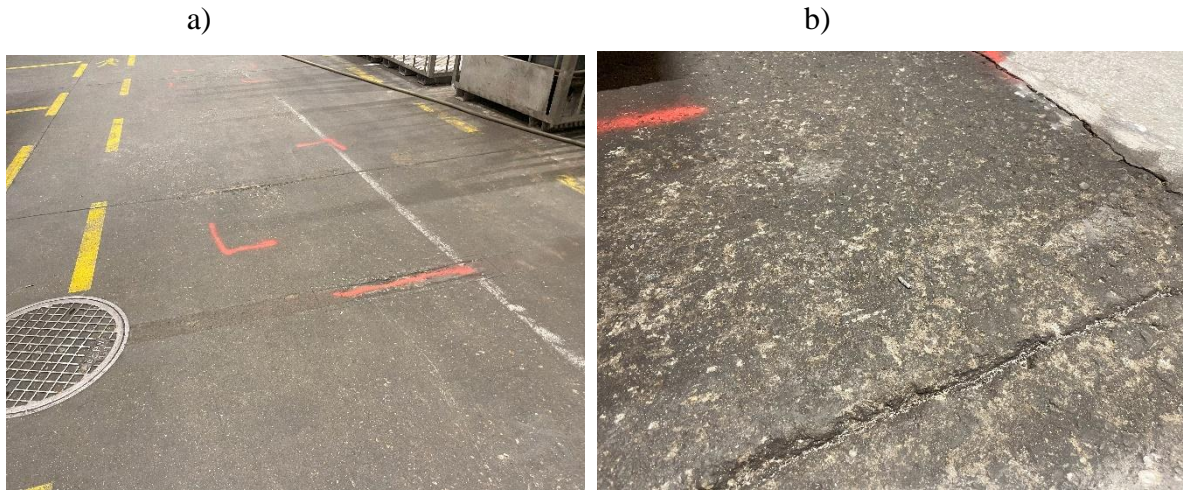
Concrete industrial floor (Example 1) before repair: a), b) walkways
